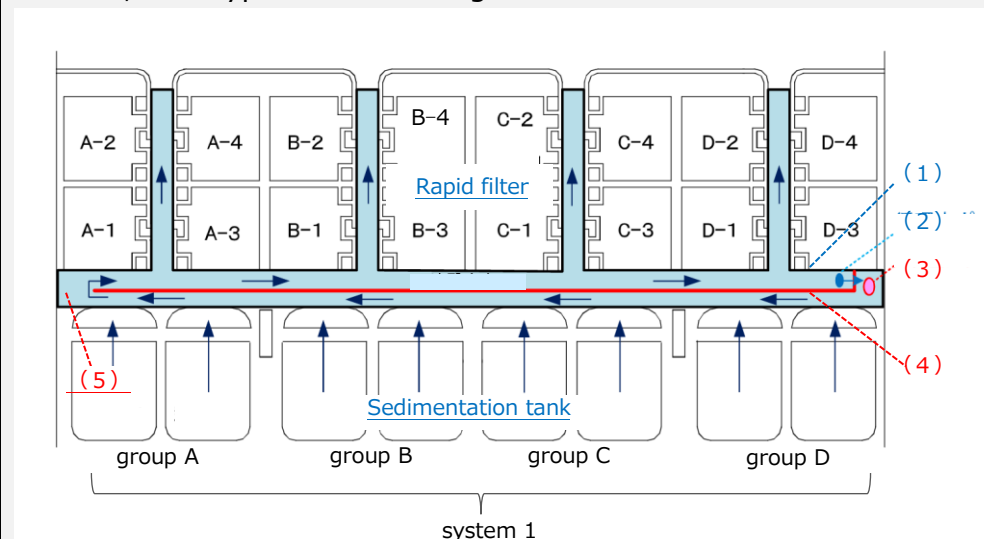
Overview of the adopted sedimentation water culvert improvement plan
